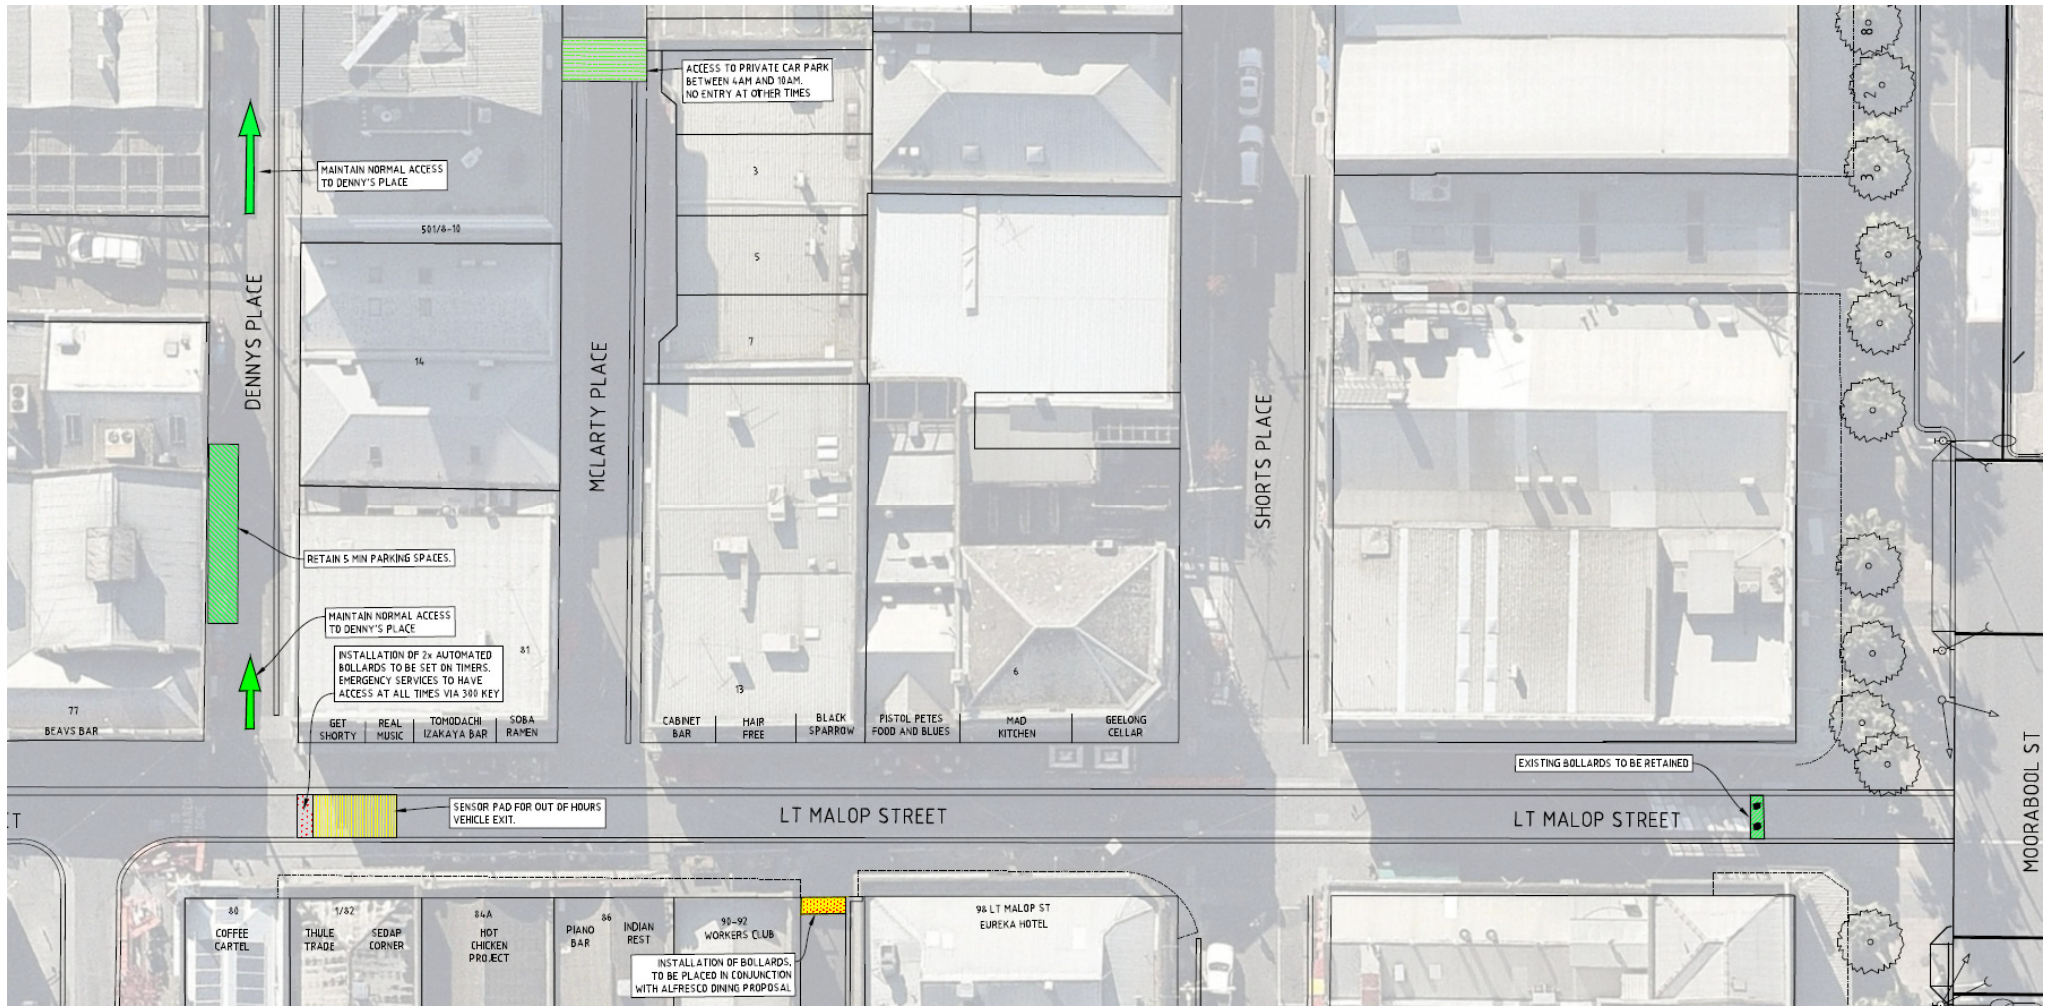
LAYOUT PLAN OF AMENDED PROPOSAL (NOTE: REFER TO ATTACHMENT 2A FOR COPY OF FULL PLAN)
